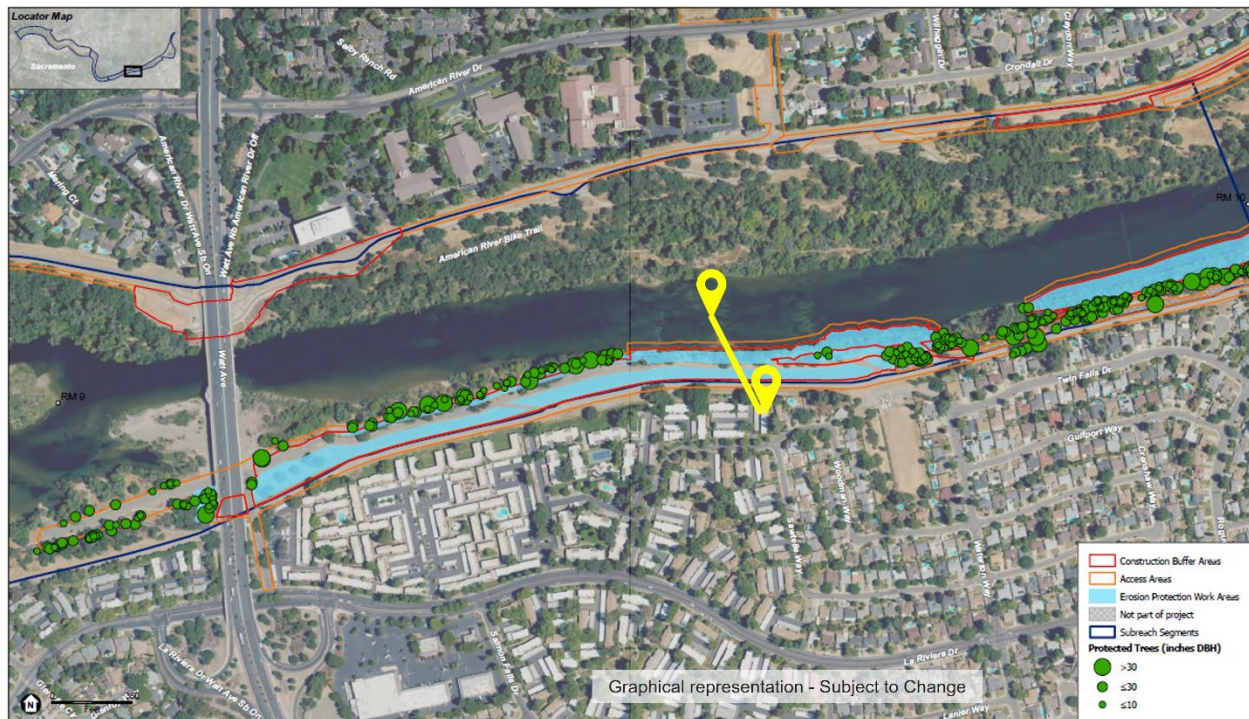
Layout of Segment 3-5 erosion protection feature and cross section location
